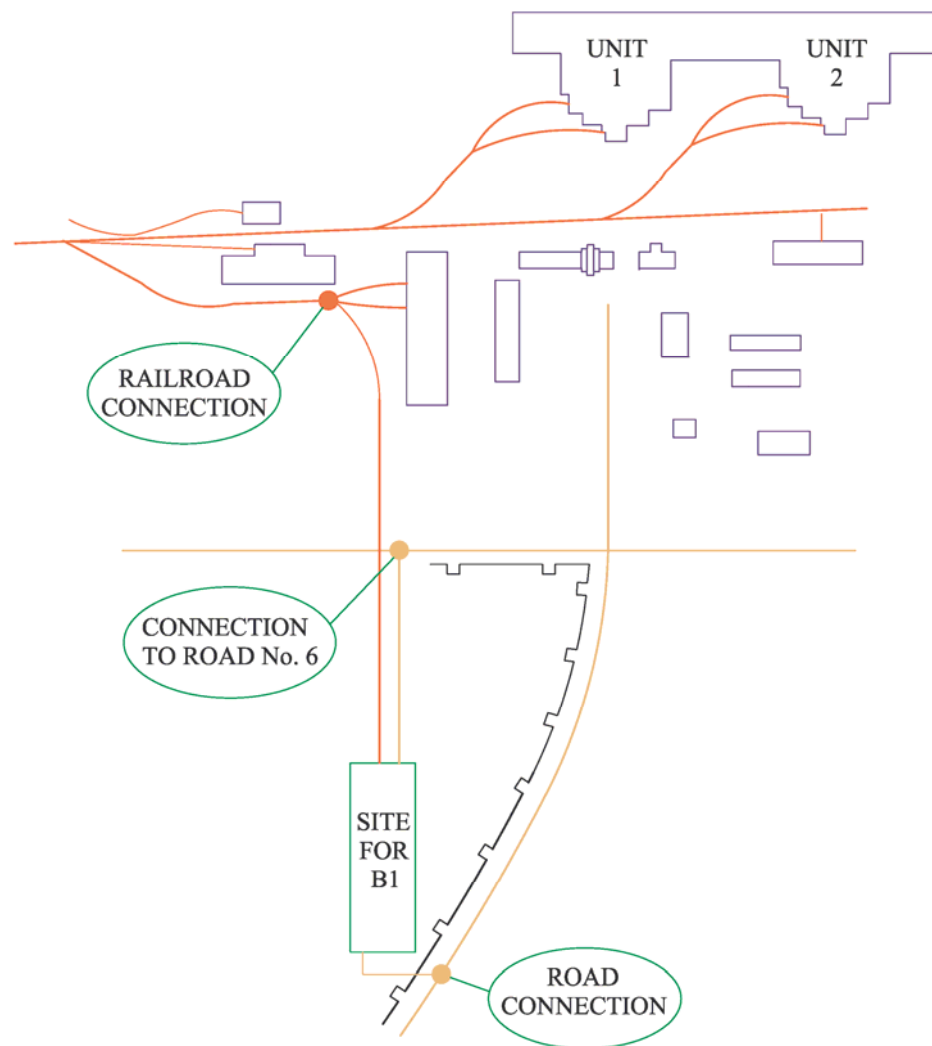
Scheme of the railroad and roads connection with the existing system
